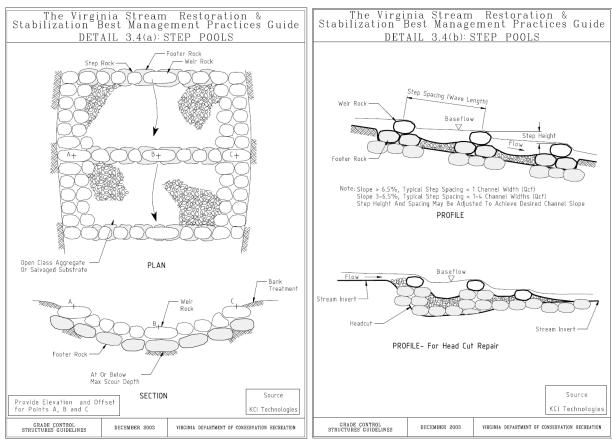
Step Pool Plan and Profile Source: Virginia Stormwater Management Handbook
